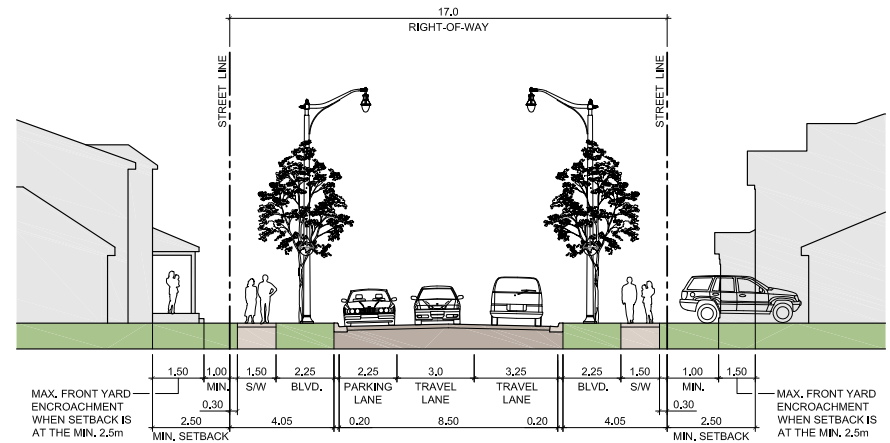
Low Density Residential / Local Road Streetscape - 17.0m R.O.W. / 2 travel lanes / on-street parking on one side / 4.05m boulevard.
